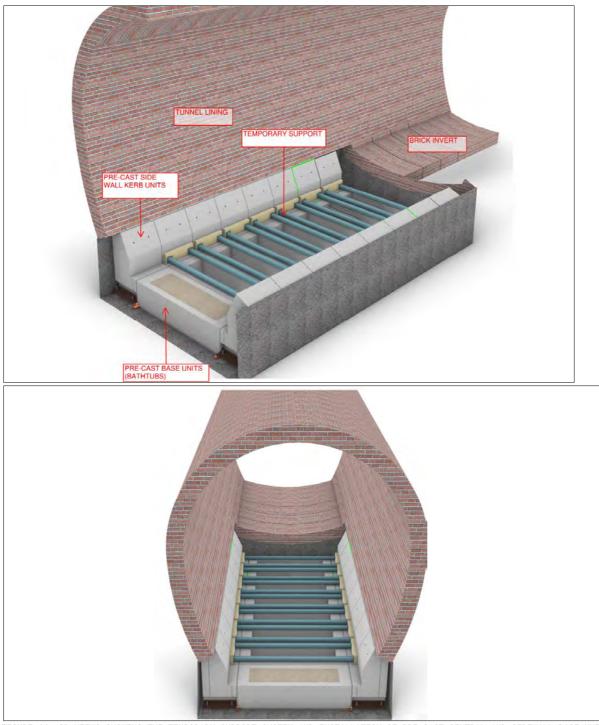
3D VIEWS SHOWING THE TEMPORARY SUPPORT SYSTEM AND INSTALLATION OF PRE-CAST CENTRAL AND SIDEWALL BASE UNITS AS SUPPORT TYPE INV-2 IN CLAY AND SAND AREAS OF THE TUNNEL. (SOURCE: AURECON/VLINE)
